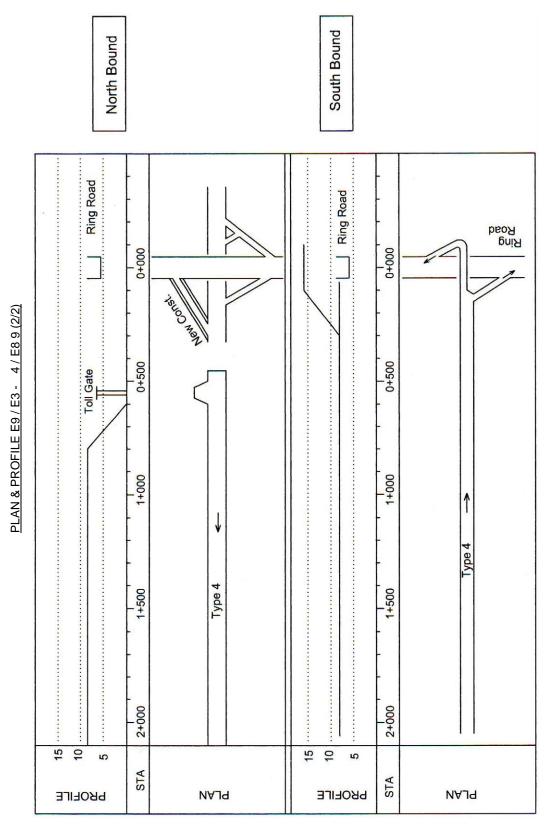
(2/2) Plan and Profile : E9 / E 3-4 / E8
